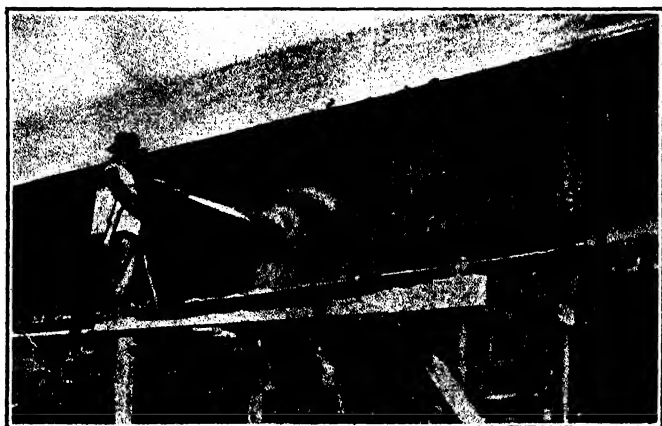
Covering a steel girder with concrete by means of a "cement gun."
